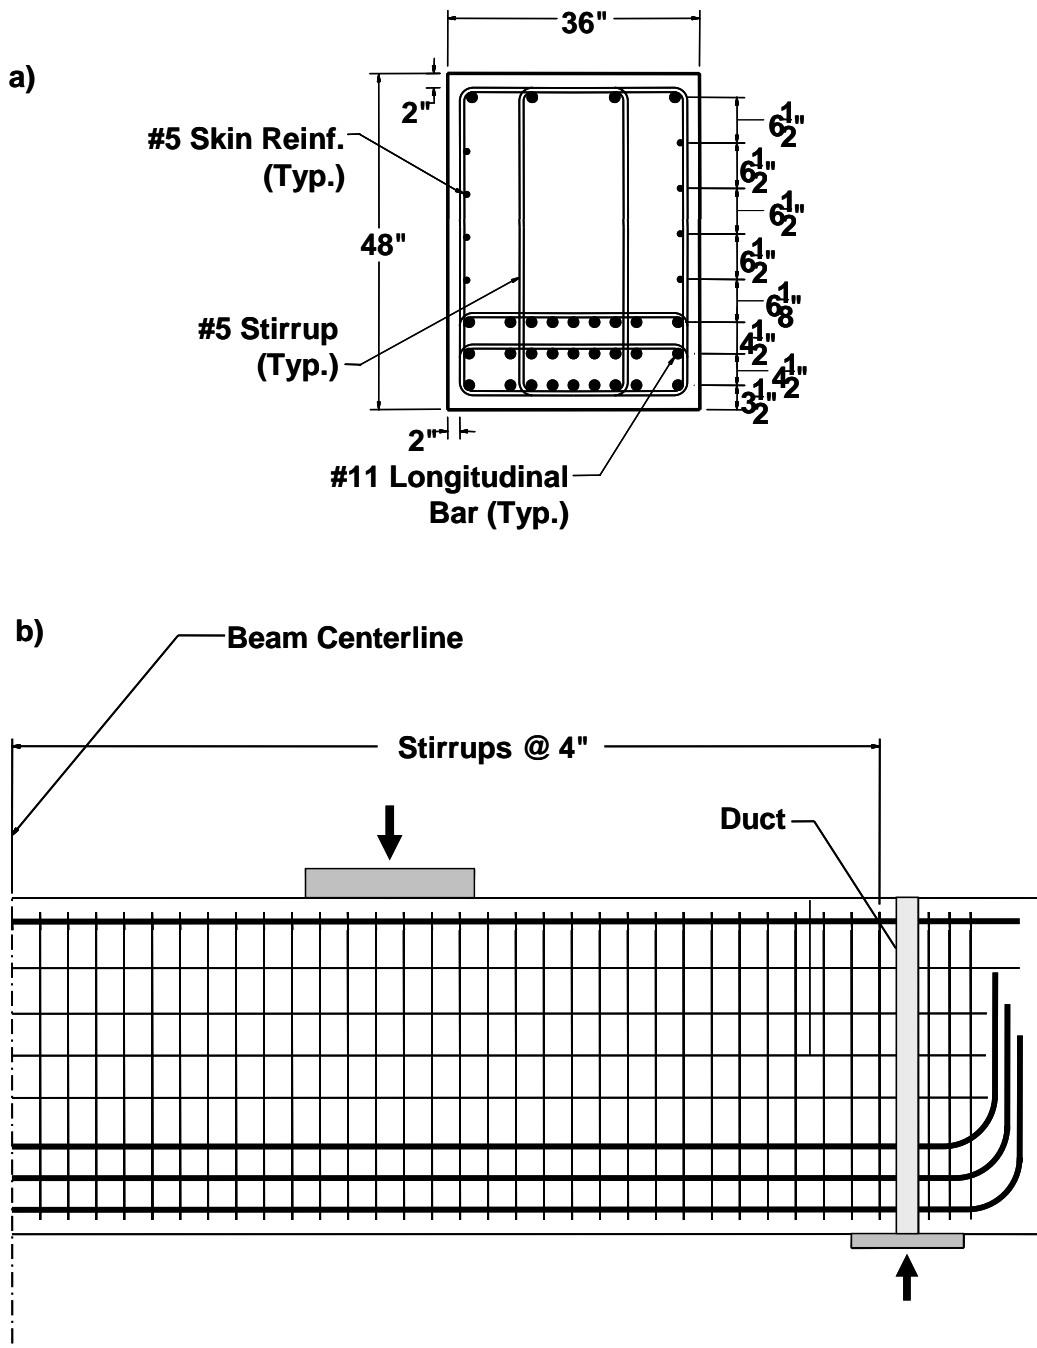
Shear span 1B a) Cross-section; b) Elevation
